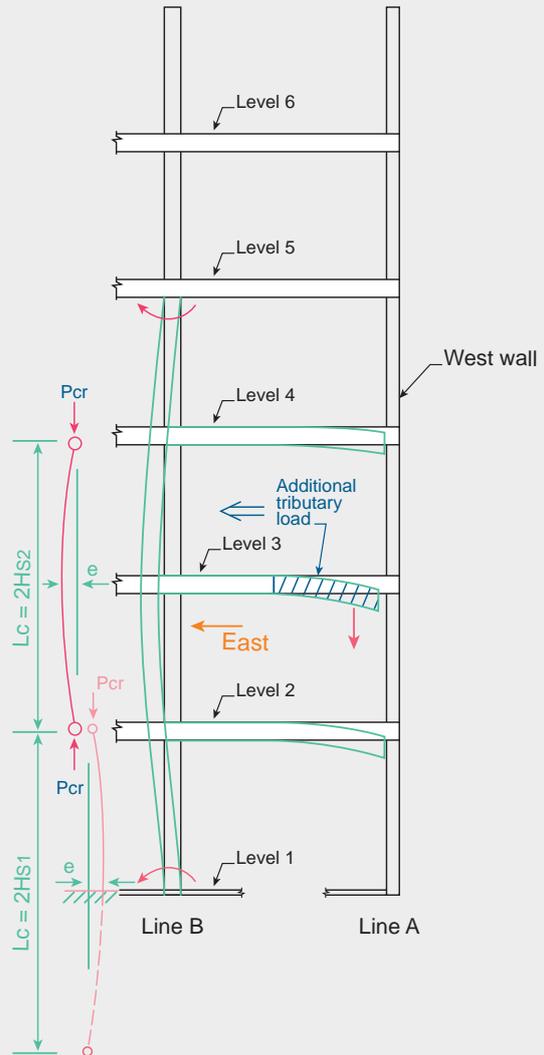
Professor Mander's diagram of four-storey double bending buckling failure starting on column line B leading to the east-west collapse failure mode
